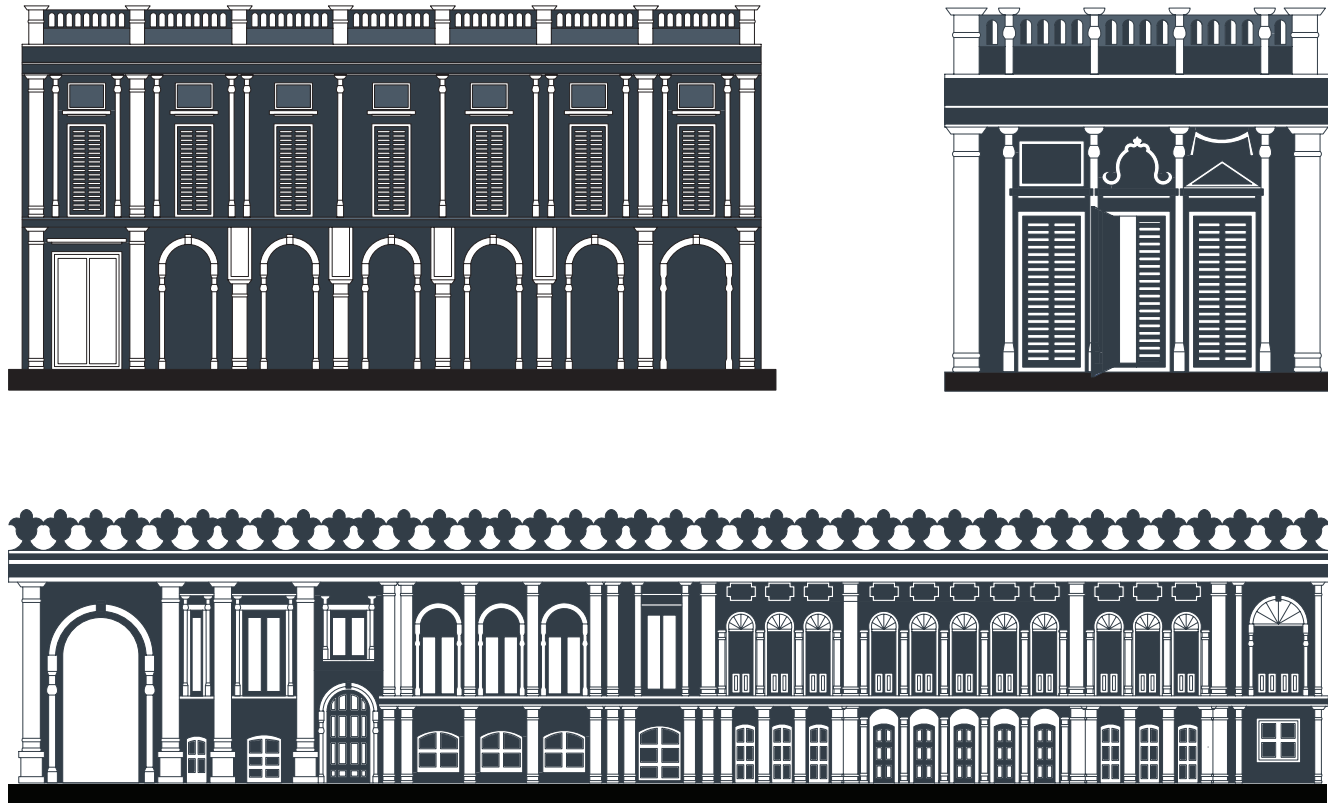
Above: Facade of an existing structure on the southern edge of the Qaiserbagh Central Garden. Below: Wall in Western Jilaukhana with details in stucco representing doors, windows, and columns.
